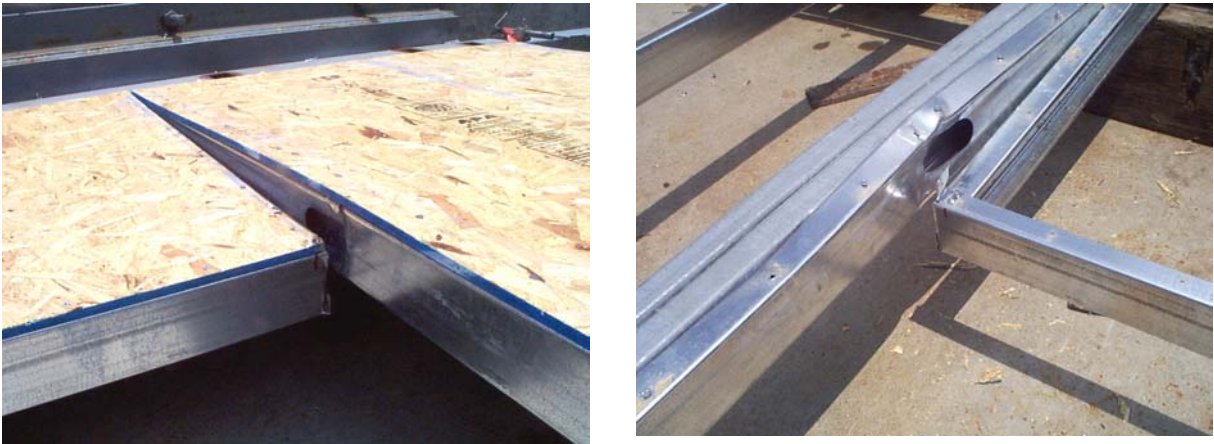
Hinging of the panel below openings on wall track due to failure of tabs.
